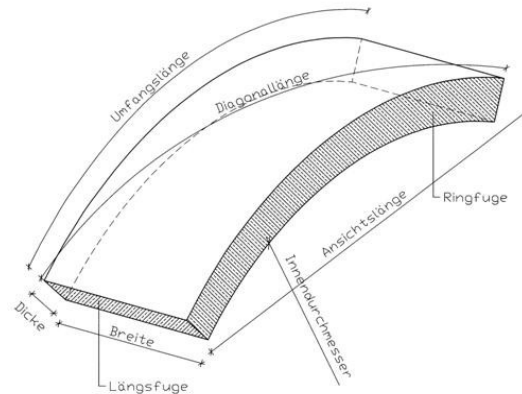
Main measured segmental dimensions that require definition of tolerances.
